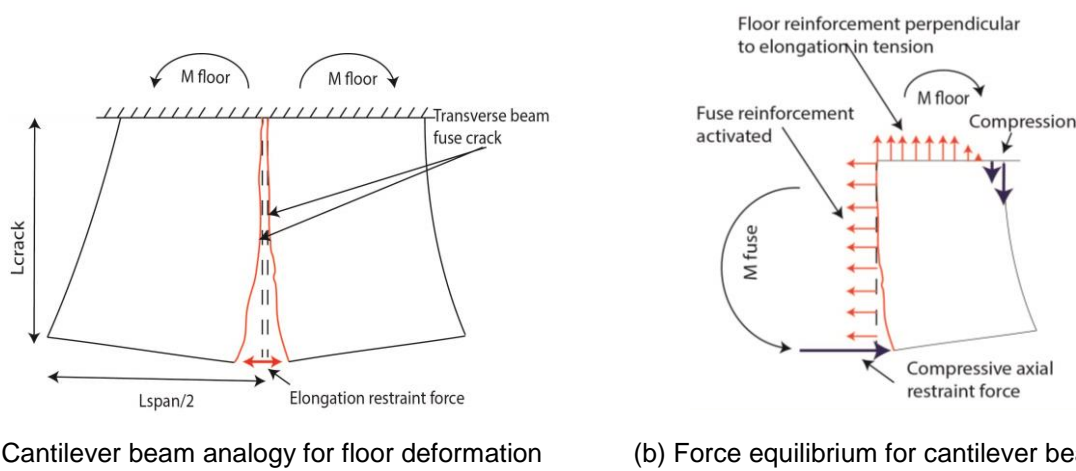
Cantilever beam analogy as limiting floor capacity when transverse beam fuse opens
